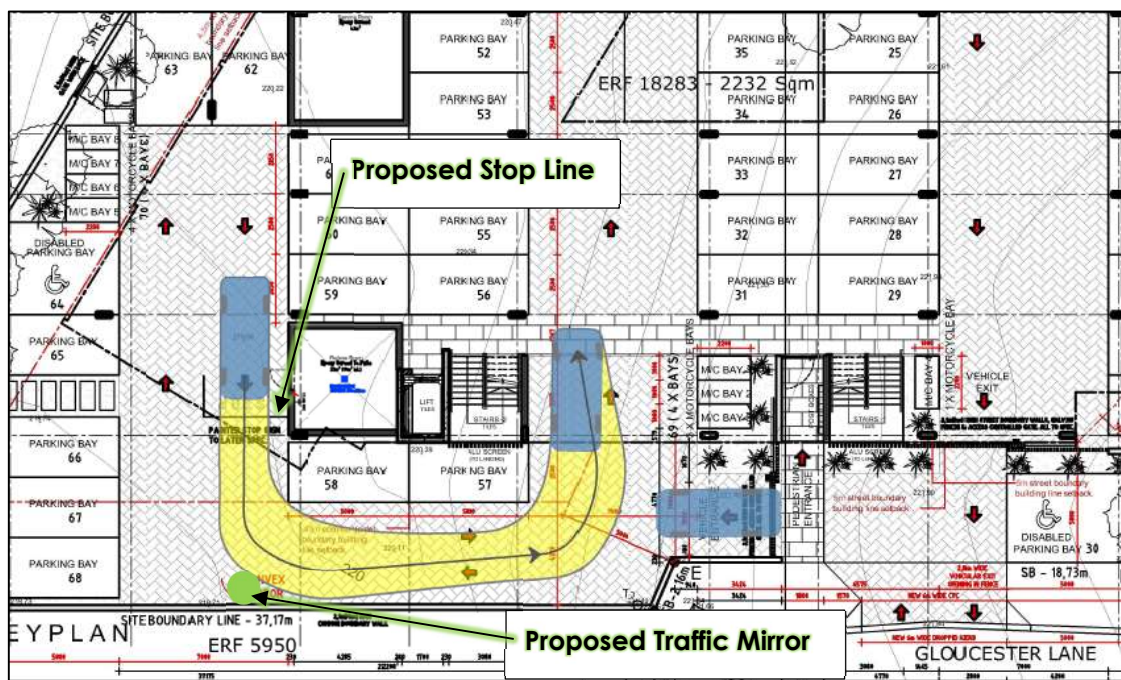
AutoTurn - Parking aisles (two way section exiting)
